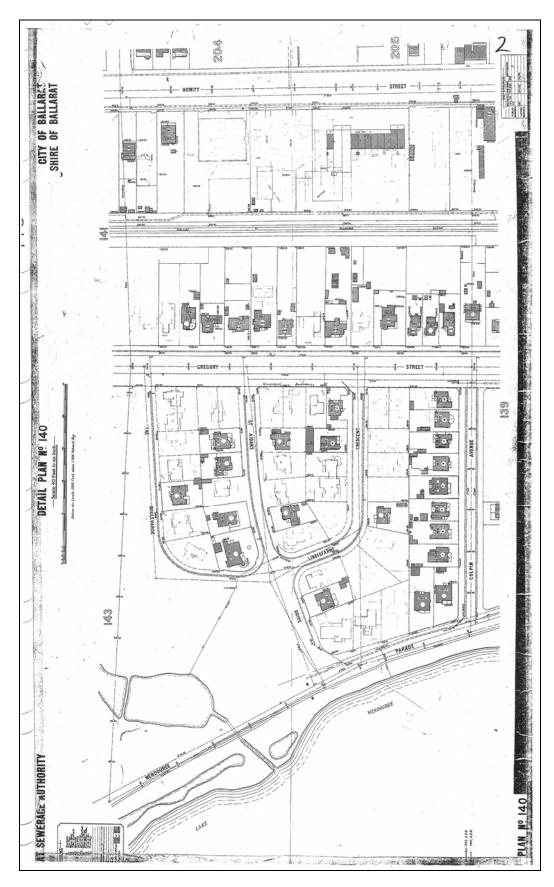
Ballarat Sewerage Authority Plan, 1947(a). Source: Planning Department, City of Ballarat.
